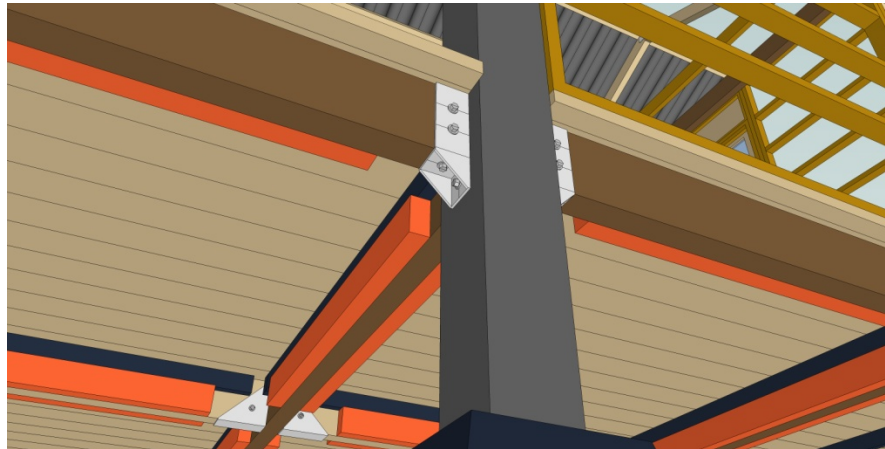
Modular flooring are supported by ledgers that are pre-assembled to the main floor beams.
